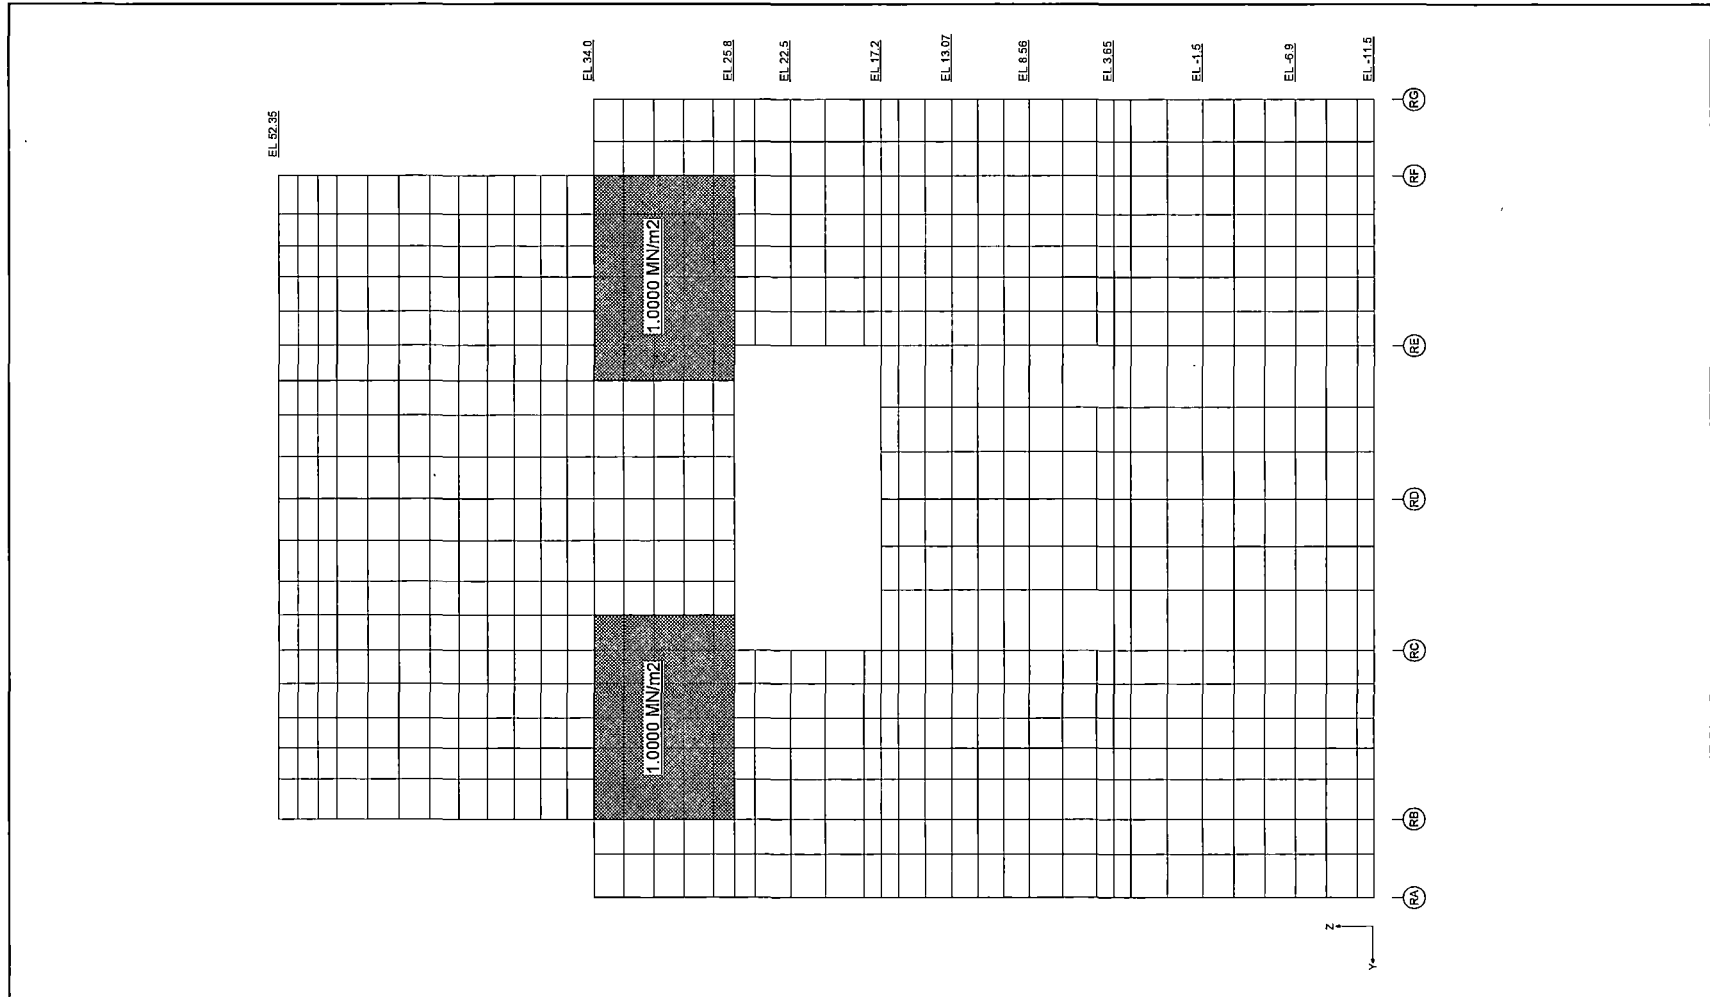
Containment Pressure Load (IC/PCCS Pool: External Wall R1)
